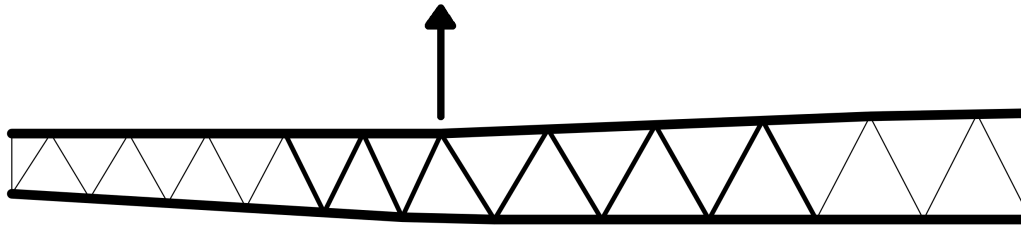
The girder bracing is made of two sizes of flat section. The light elements have sections of 2"×3/8" (50×10mm) and the dark elements 2"×0.5" (50×13mm) sections.
